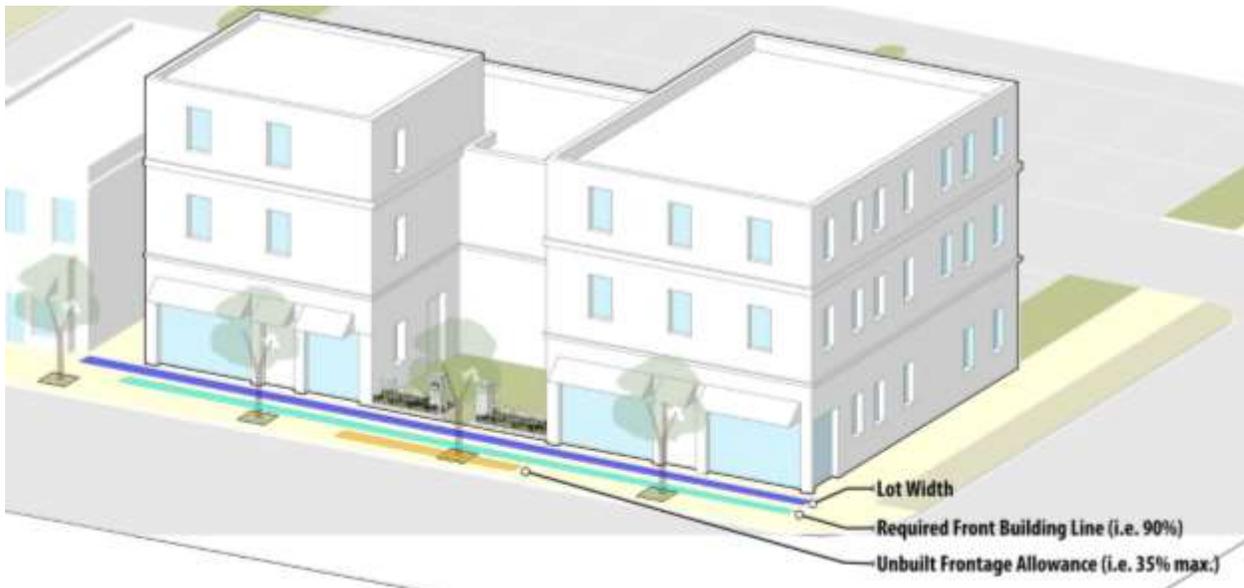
B: Required Front Building Line and Unbuilt Frontage Allowance
